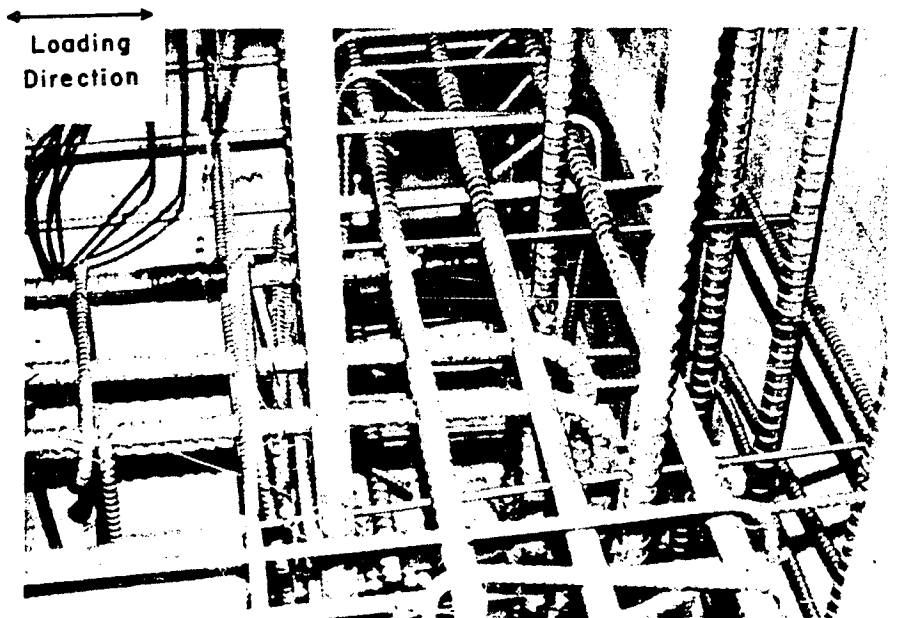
Exterior joint reinforcing detail, seven-story structure
